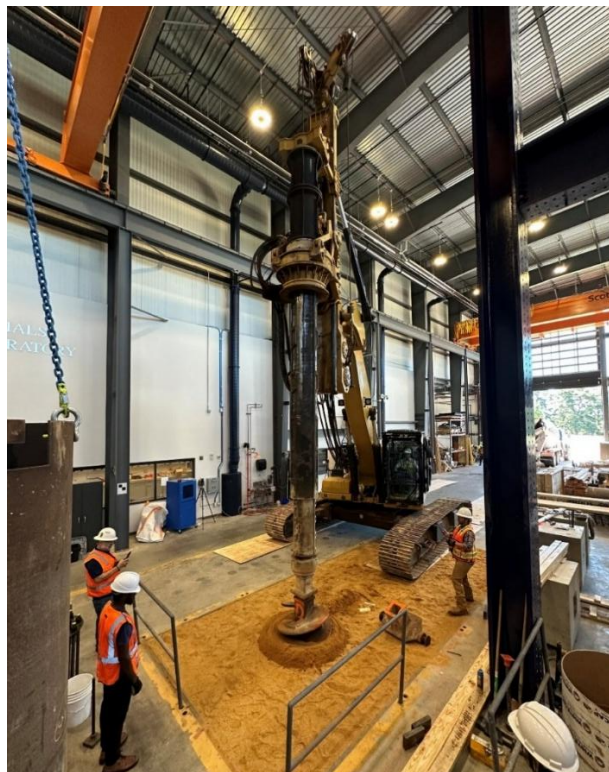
Excavating hole using the drill rig from Russo Corporation
